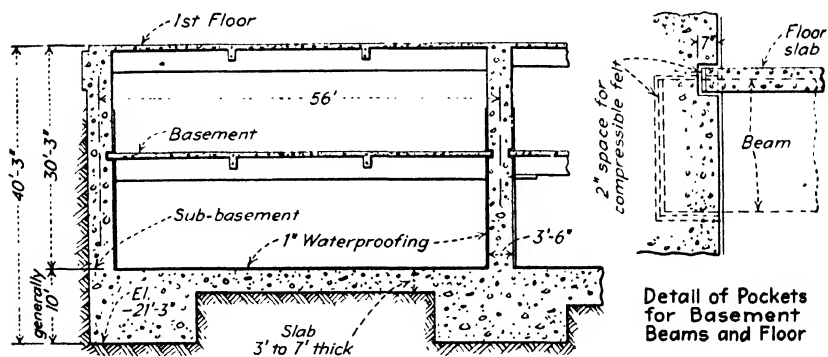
Reinforced-concrete Box Substructure of New England Mutual Life Insurance Co. Building in Boston.
